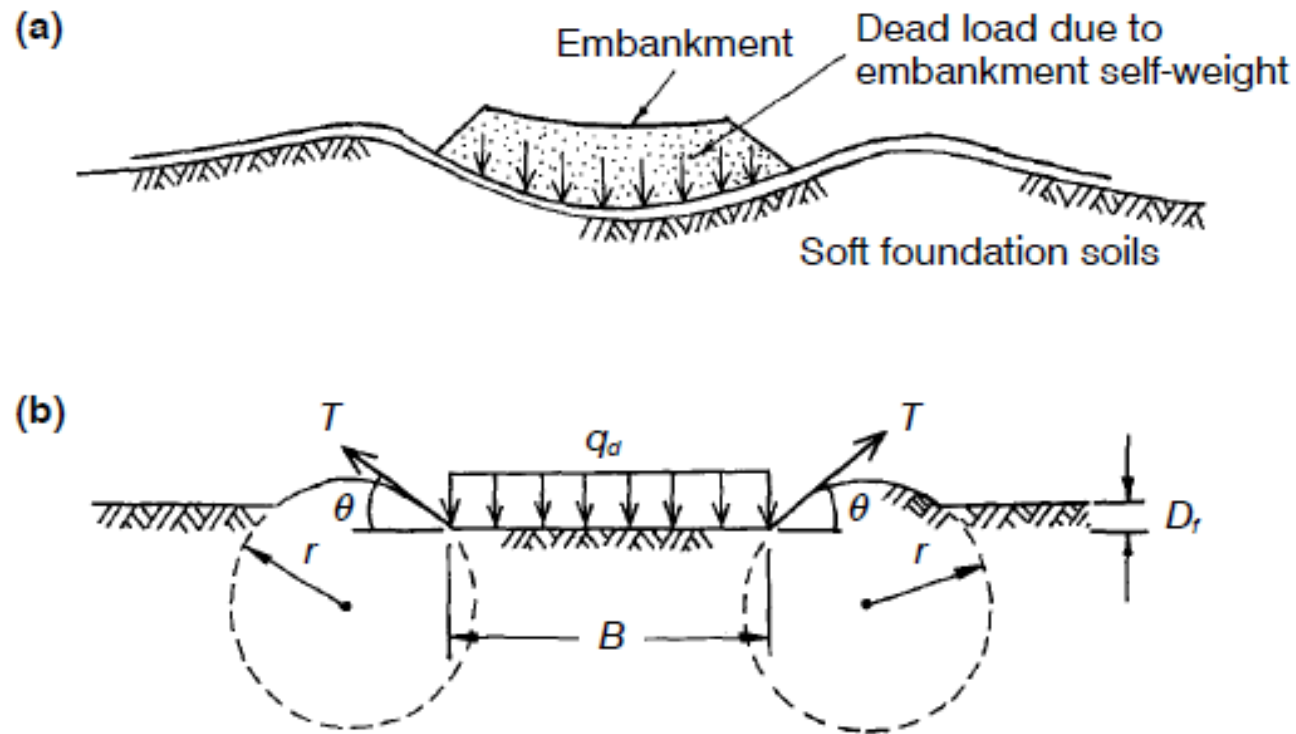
Design concept for embankment construction: (a) ground deformation under embankment; (b) modelling of ground deformation.
